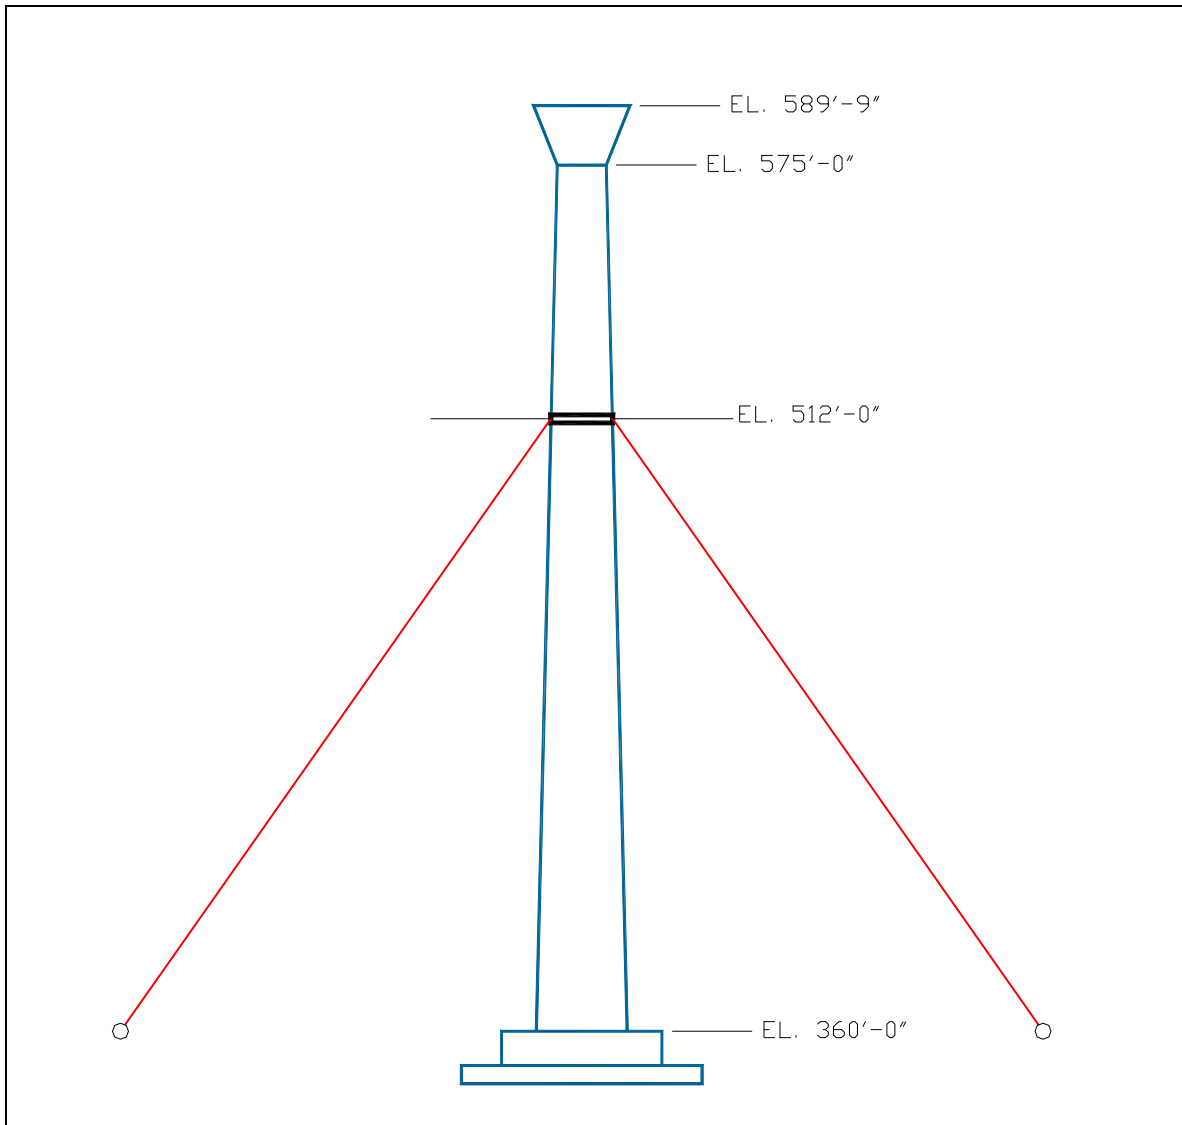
Elevation view of proposed guy-wire retrofit option
